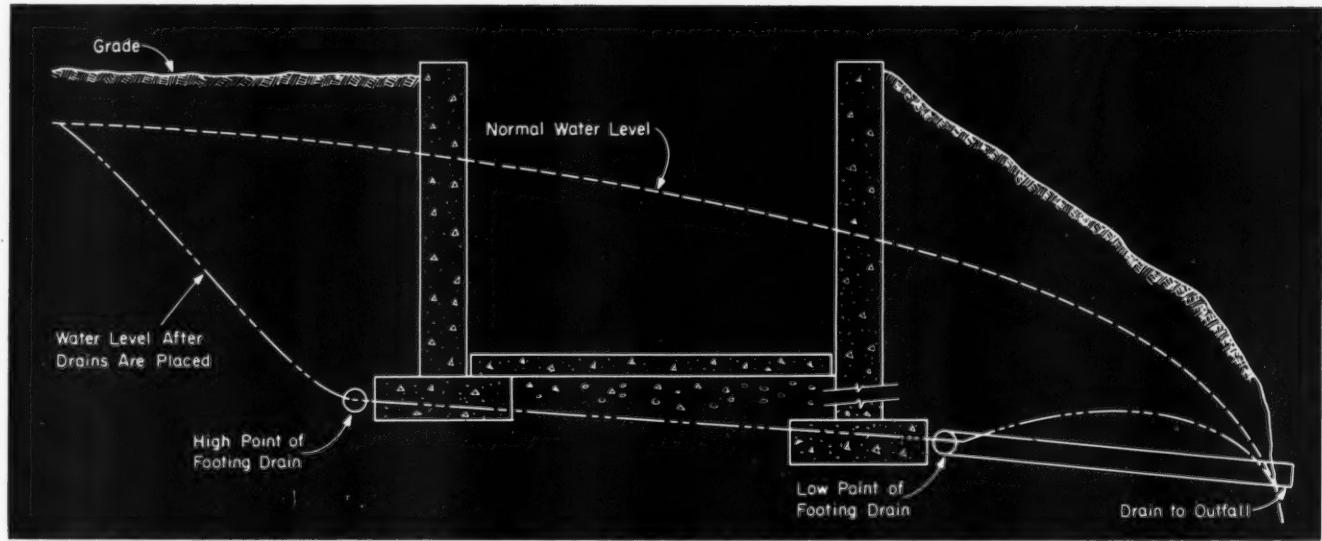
FOOTING DRAINS SHOULD BE BELOW BASEMENT FLOOR LEVEL BUT ABOVE LOWEST POINT OF FOOTINGS.
